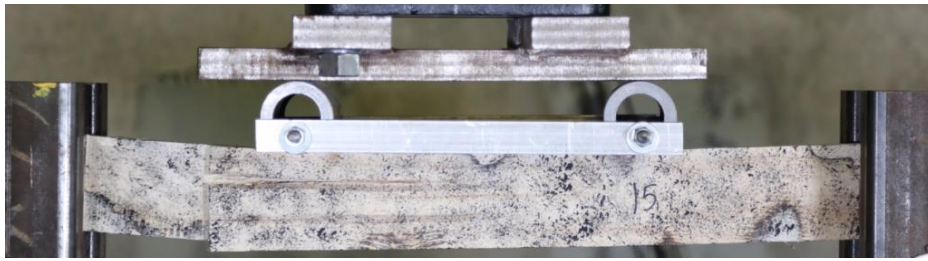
Failure of an LVL beam, carved to the 10 mm damage state.
